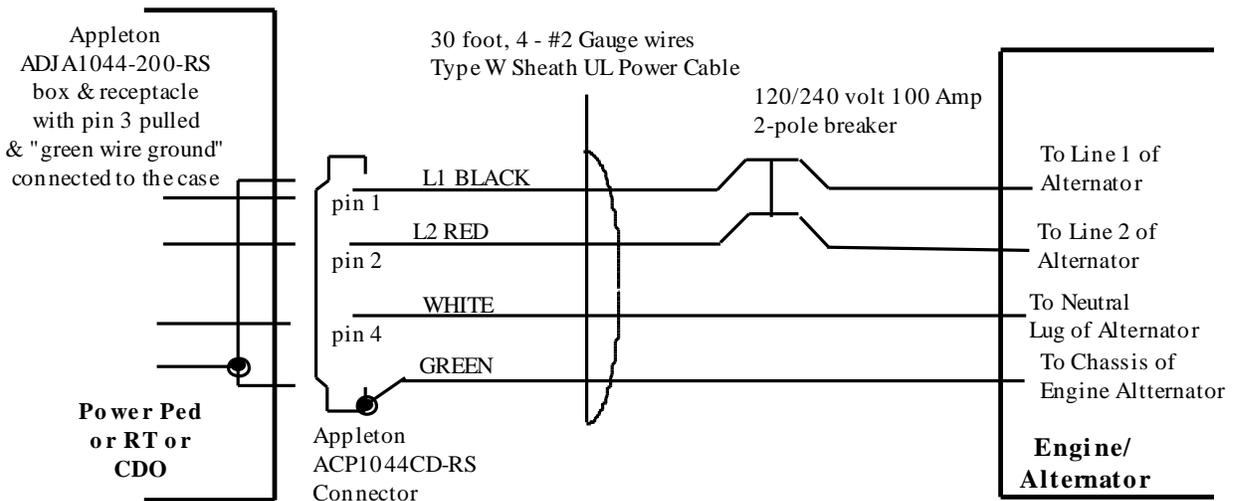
100-Ampere Cable Hardwired to Single-Phase Engine-Alternator
